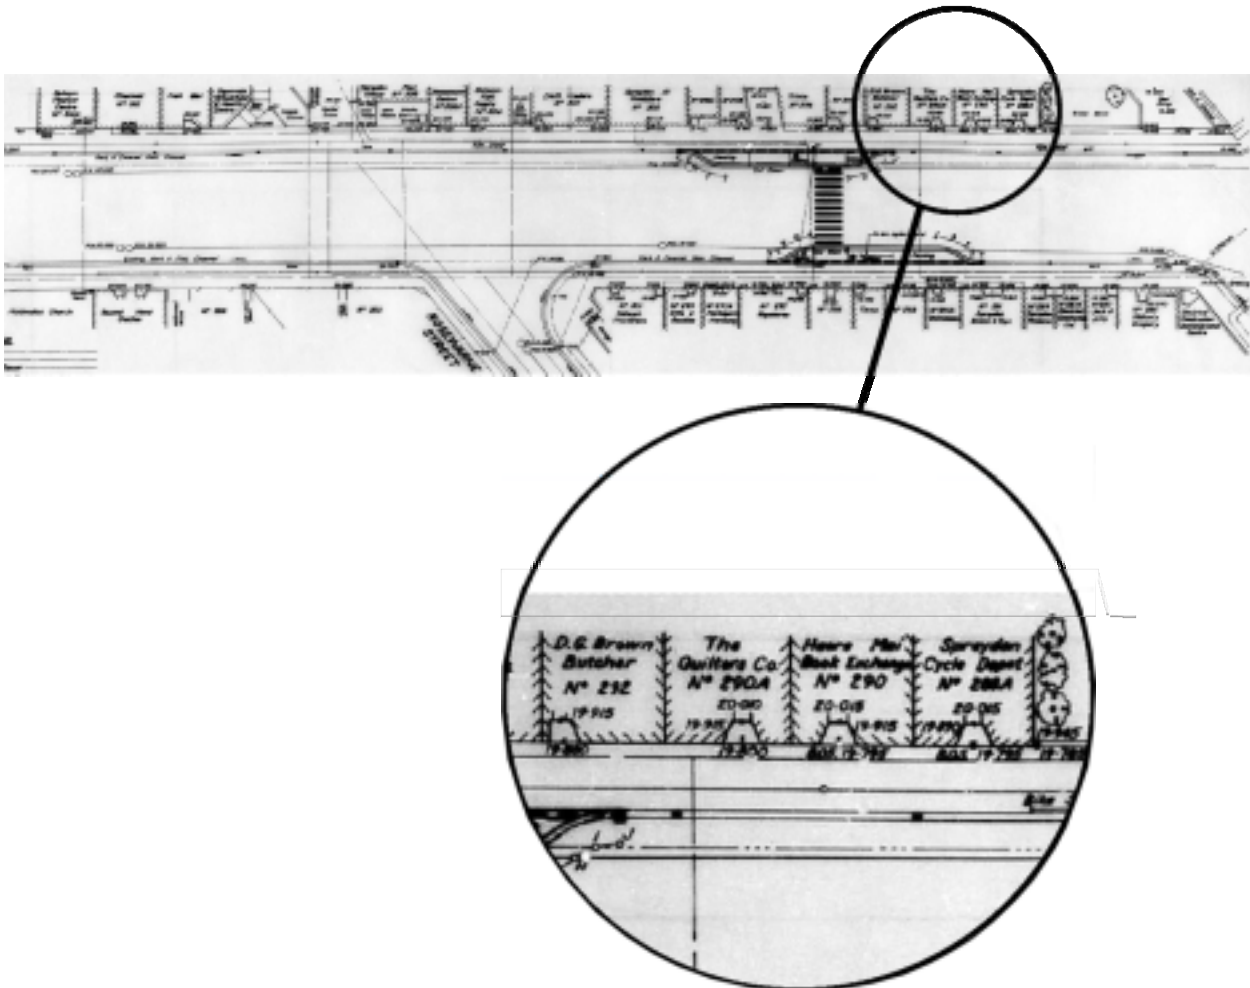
Selwyn Street Shops in a 1985 roading plan showing the diversity of shops and services
